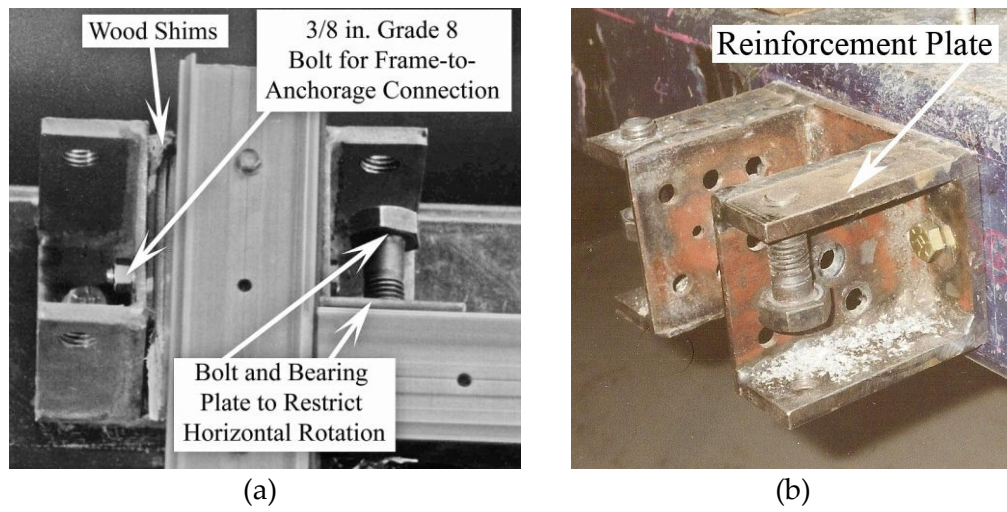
Pictures of mullion-to-facility connection details where (a) is a view of the connection details with a mid-rise CW mullion in place and (b) is a view of the anchor without CW specimen
